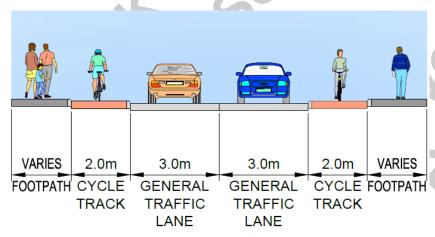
Section 1, Proposed Option 3 - Cross Section B-B
